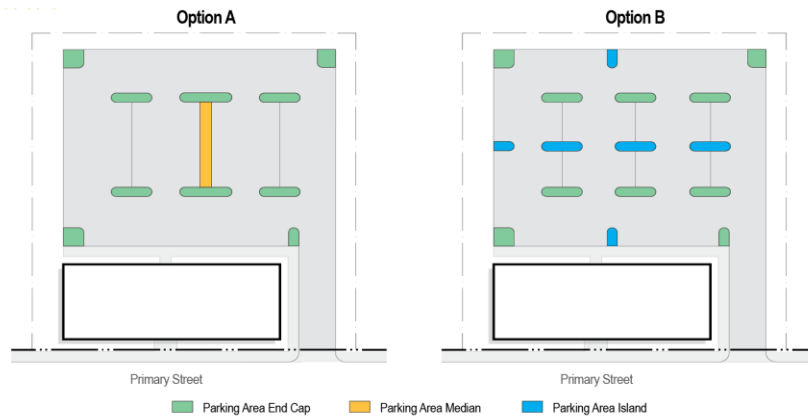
Interior Parking Area Landscape Zone Requirements for Parking Areas in Front or Side of Principal Building
